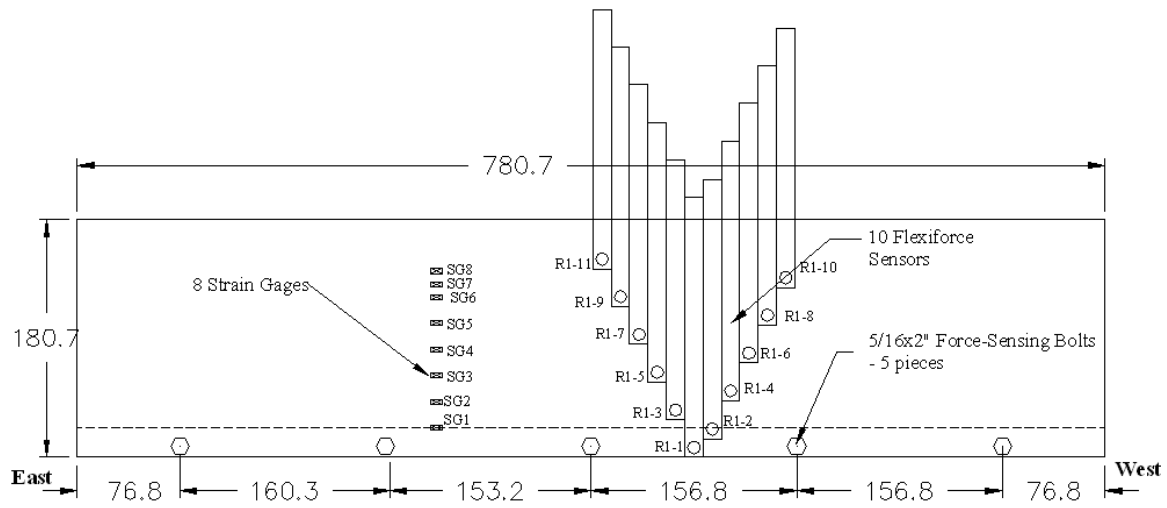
Flexiforce, strain gages, and force-sensing bolts on south stiff wall for LAA02 (mm, model scale).
